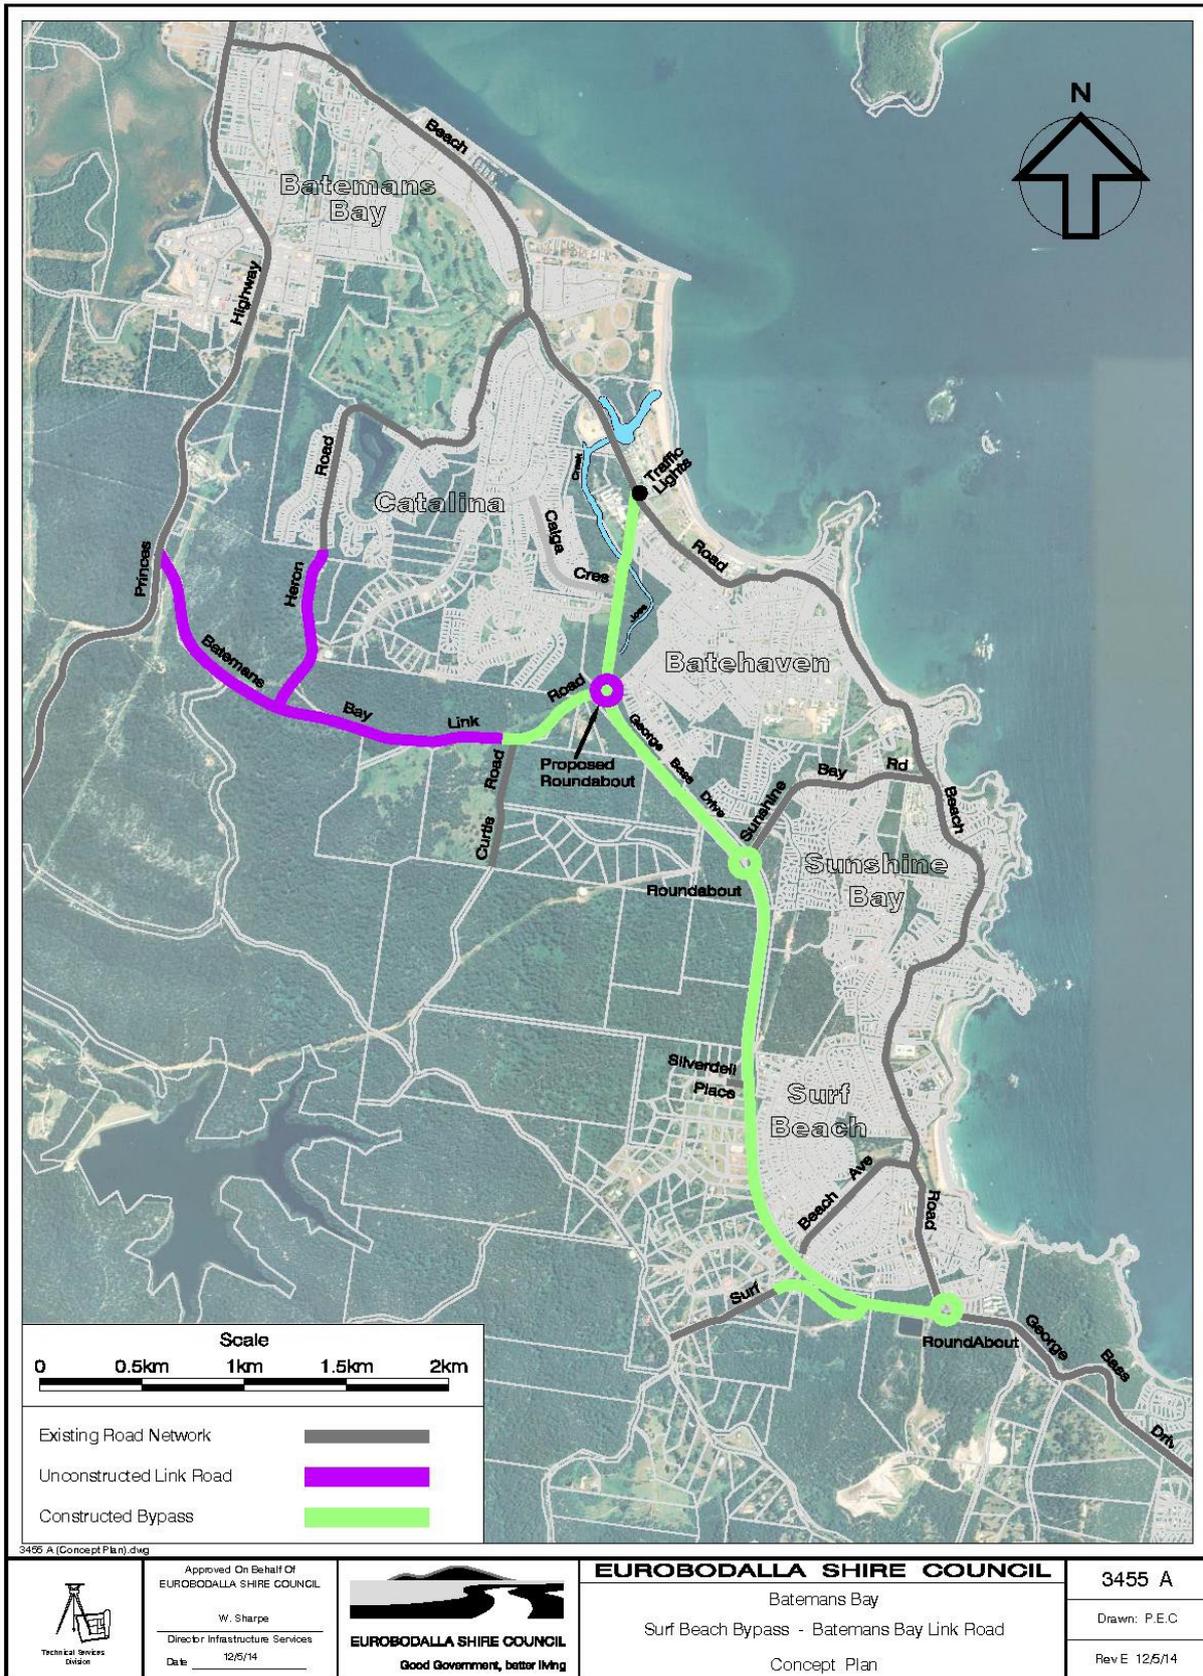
Batemans Bay Link Road Concept Plan (ESC 2014)
